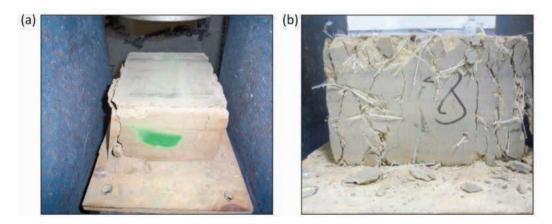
Typical failure mode of blocks (a) unreinforced blocks showing two cracks and (b) blocks reinforced with 0.8% fibers showing multiple cracks.
